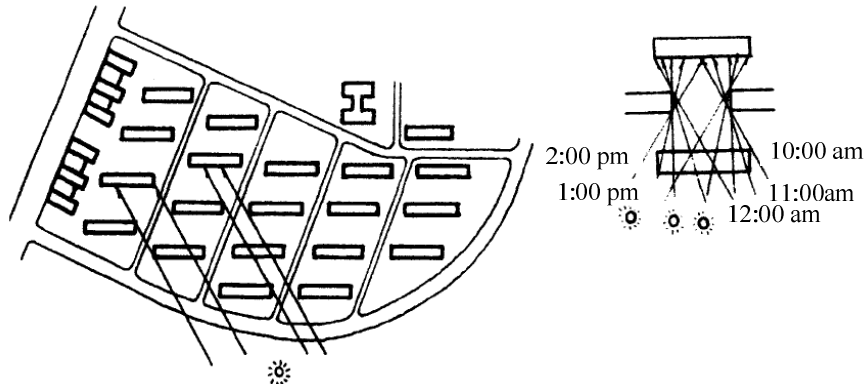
Building dislocation arrangement to improve the level of sunshine
